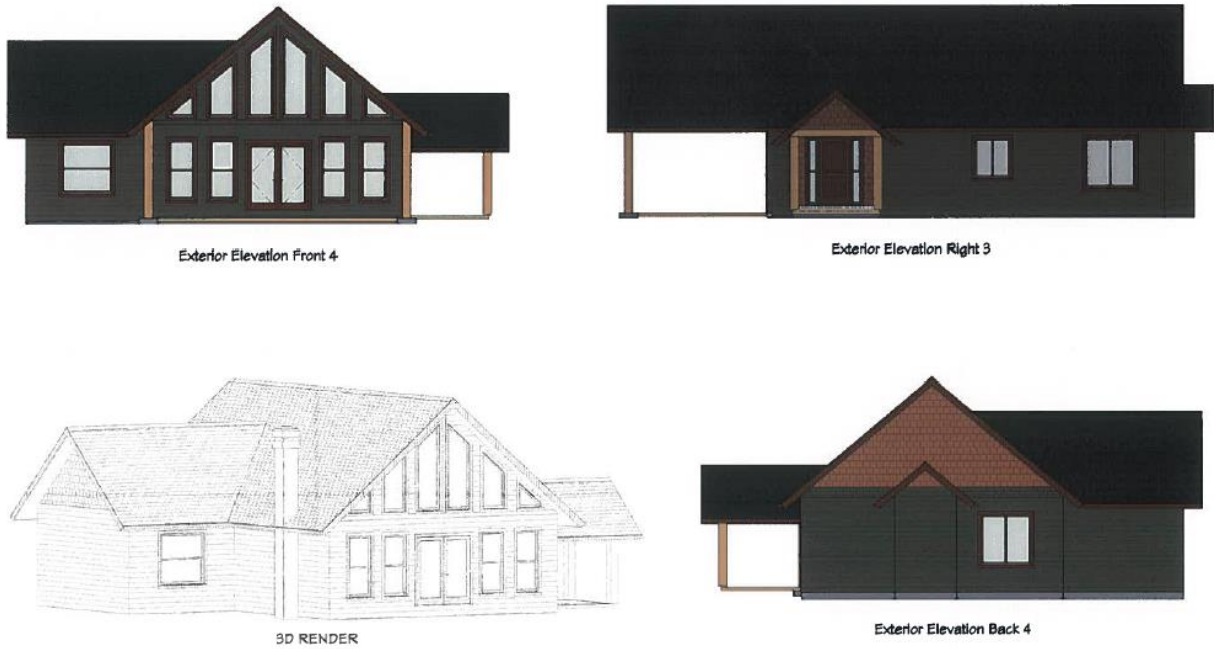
Elevation Drawings of Proposed Dwelling Unit
